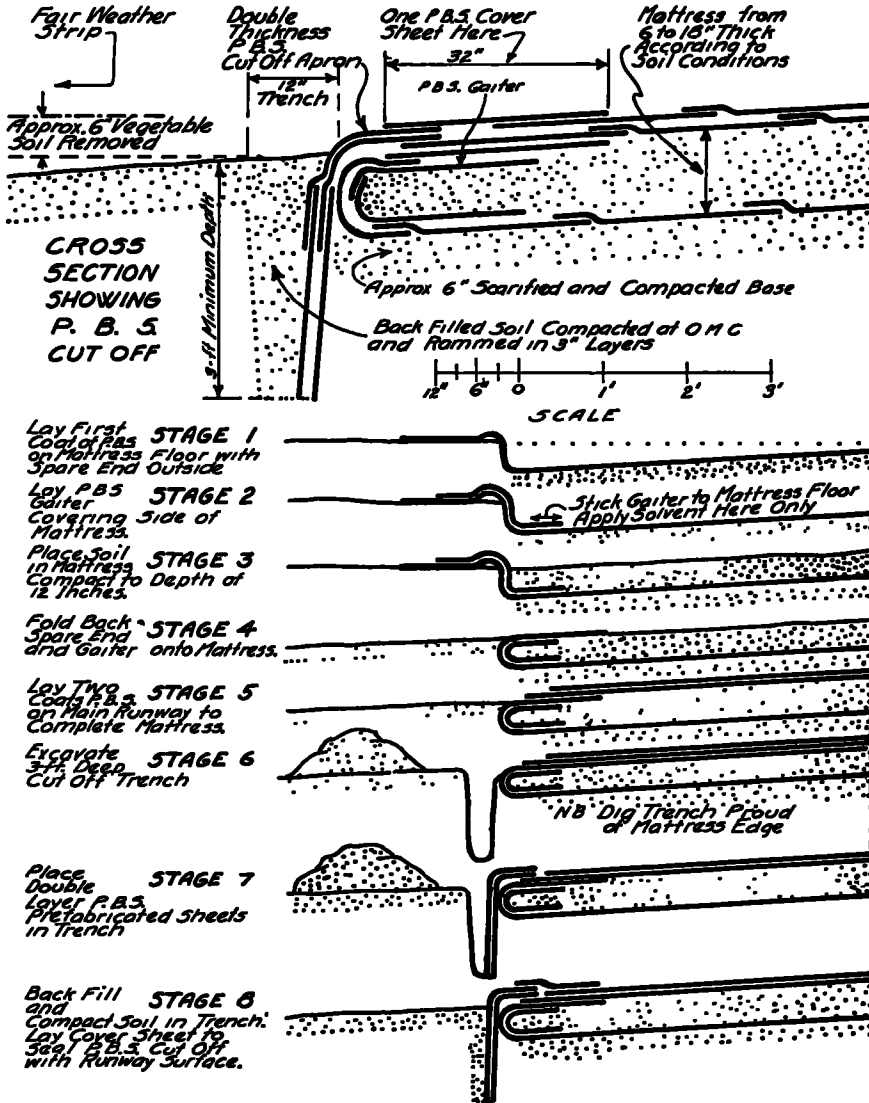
P.B.S. Runways. Cross Sectional View of Soil Base Construction
